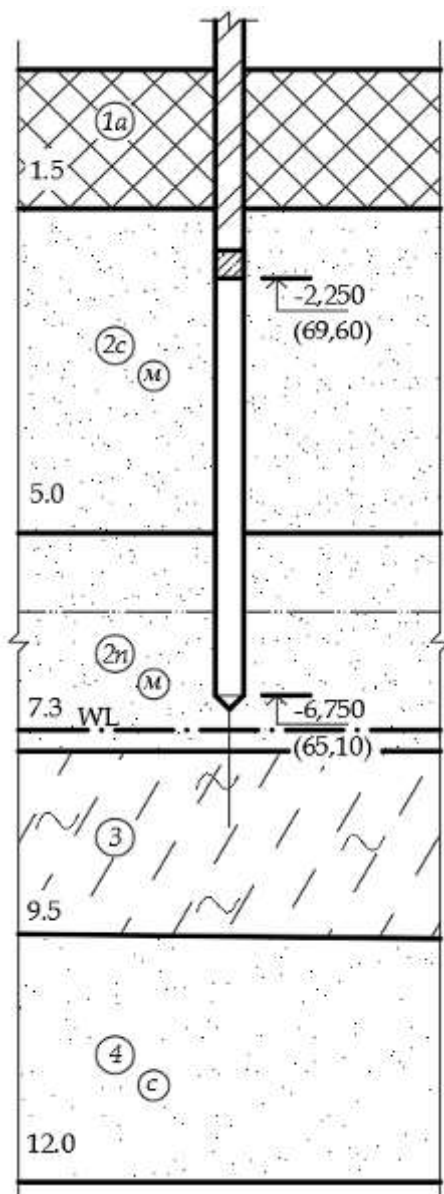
The vertical tie of the pile to geotechnical column according to SNIP 4.5 – 35
